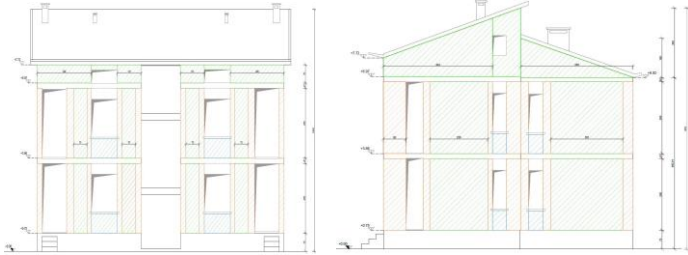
Elevation schemes of the main facades, in which the hollow block masonry is depicted in green, the solid brick masonry in orange, and the horizontal walls with reduced thickness in blue. From [248].
